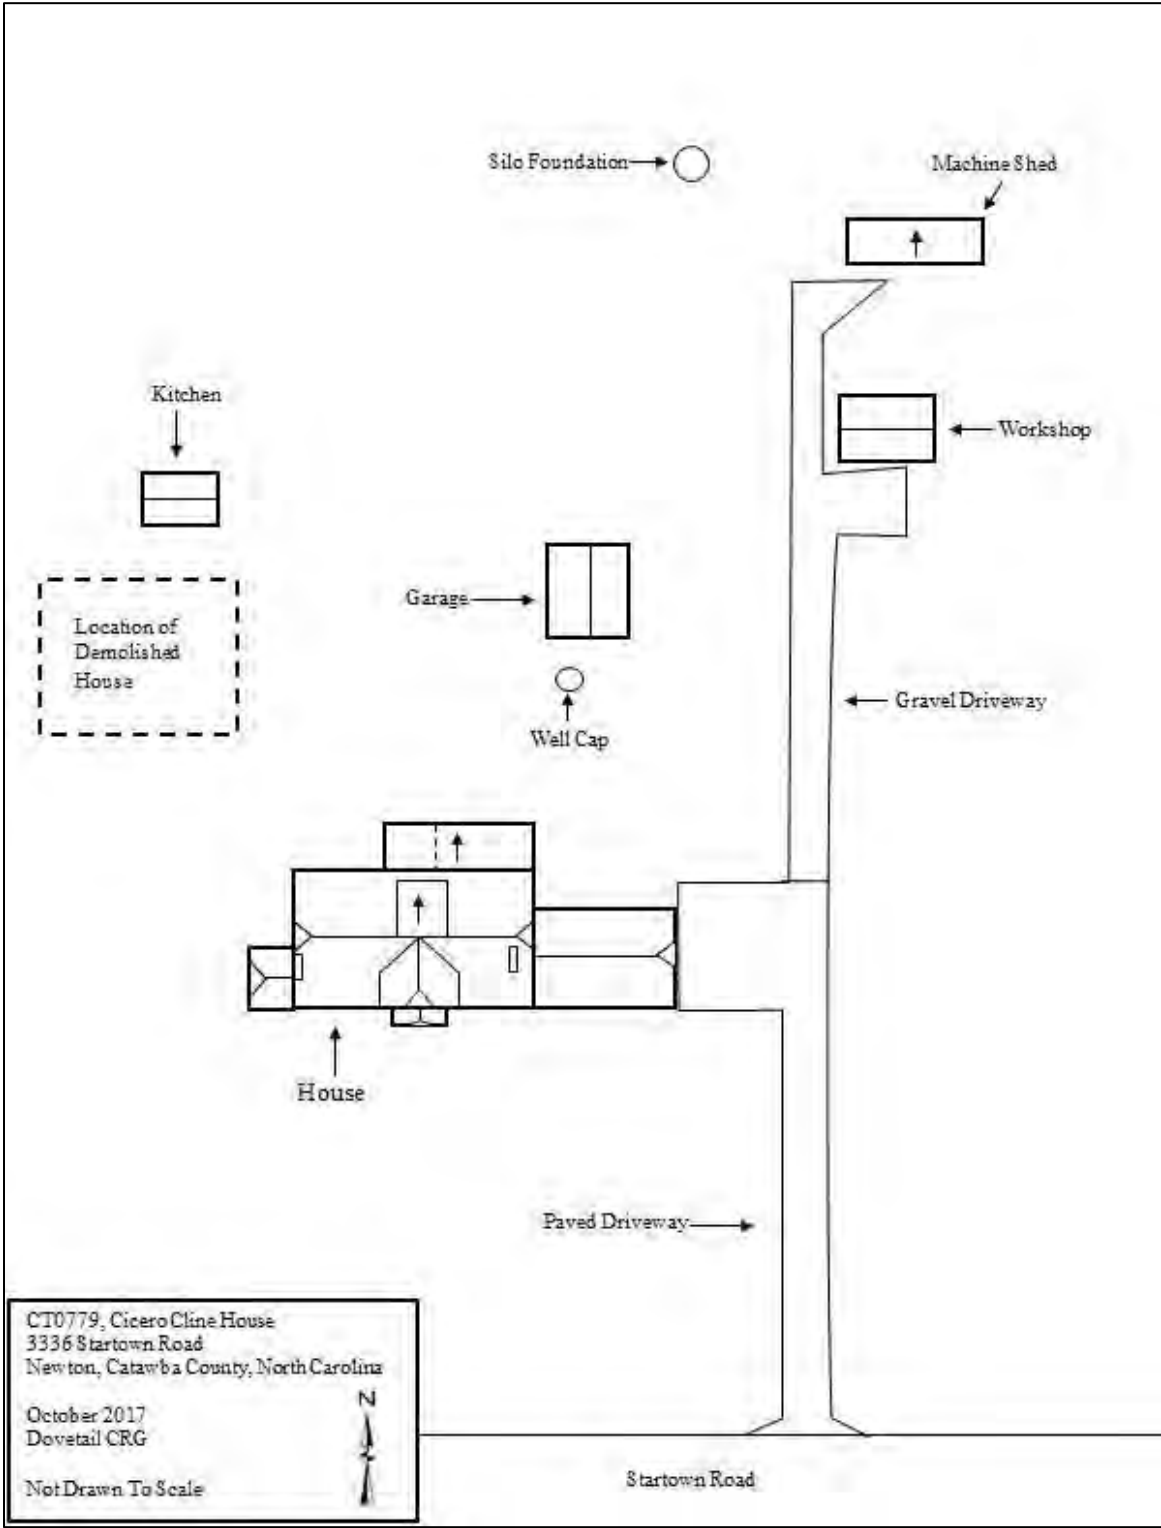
Site Plan for the Cicero Cline House (CT0779).
